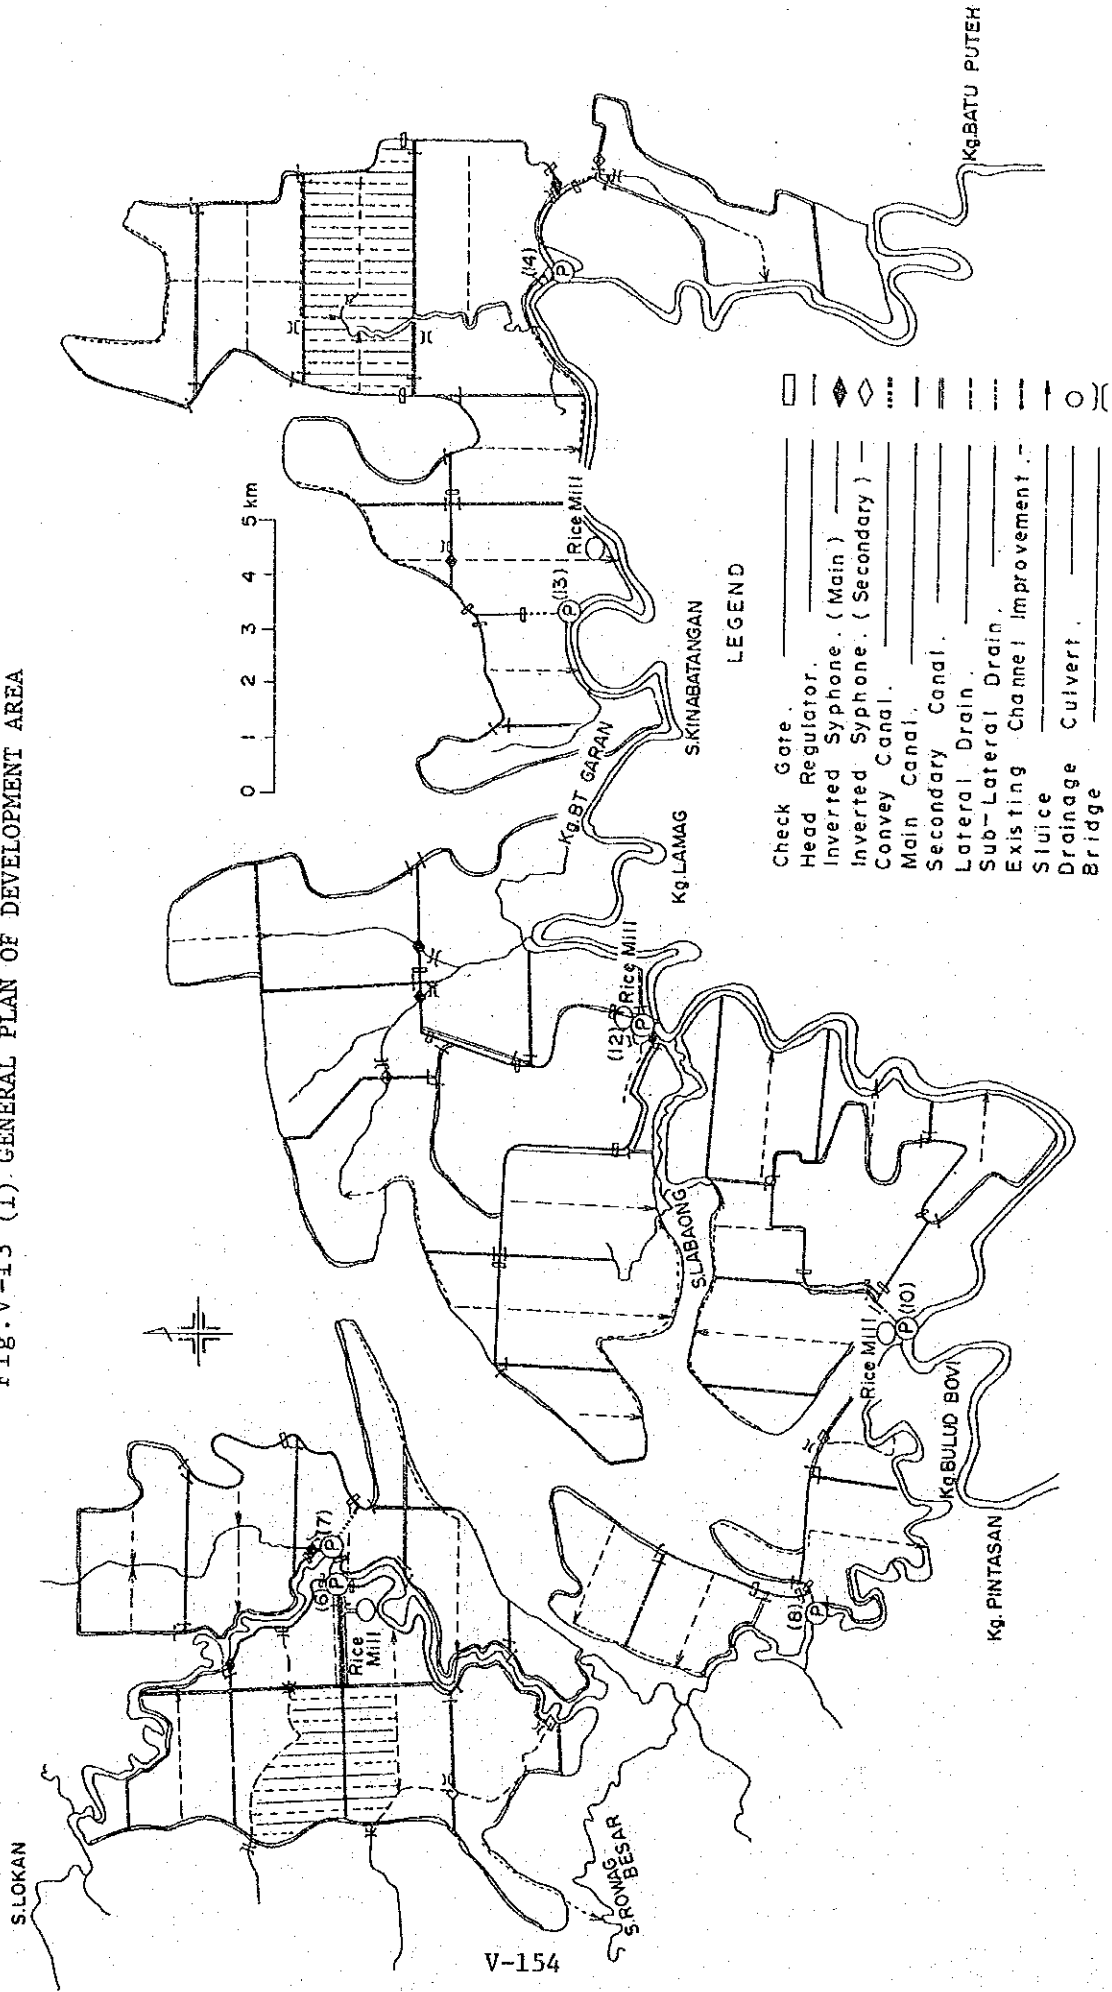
(2) GENERAL PLAN OF DEVELOPMENT AREA
